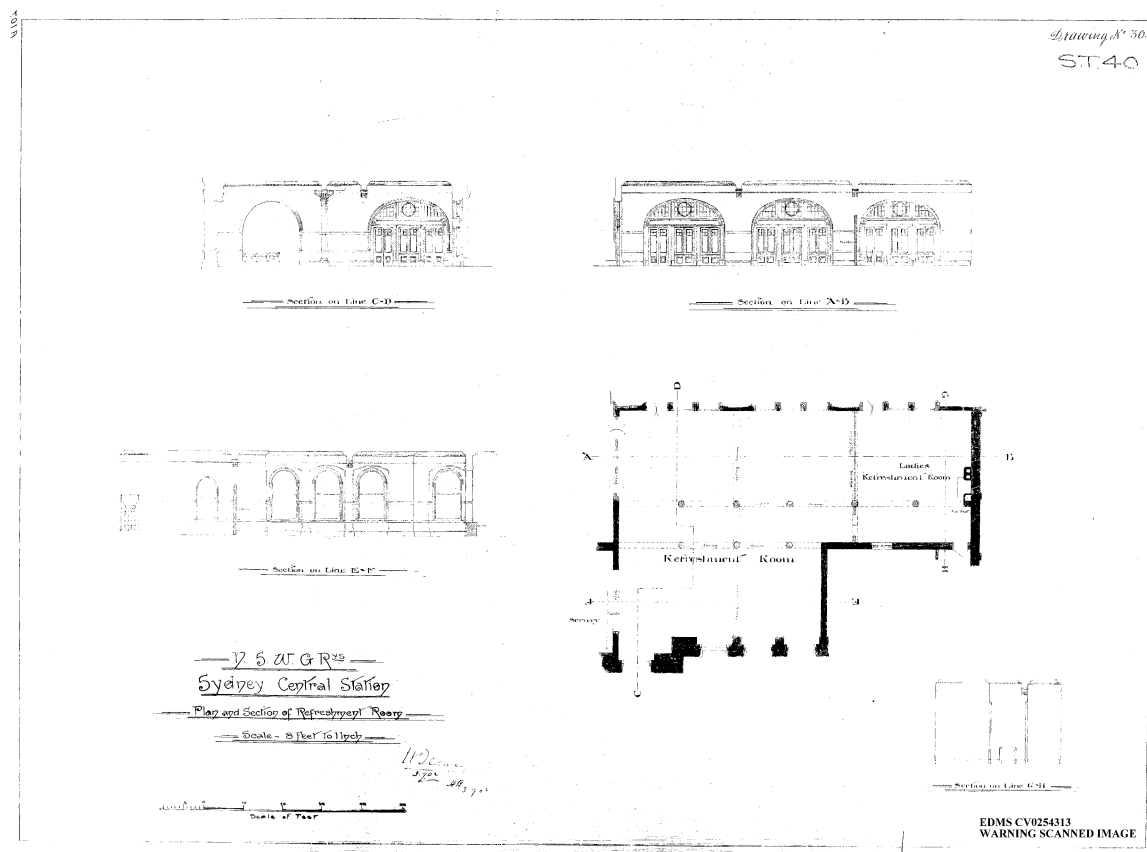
Design for the main dining hall and ladies dining hall, date unknown. <sup>192</sup>
